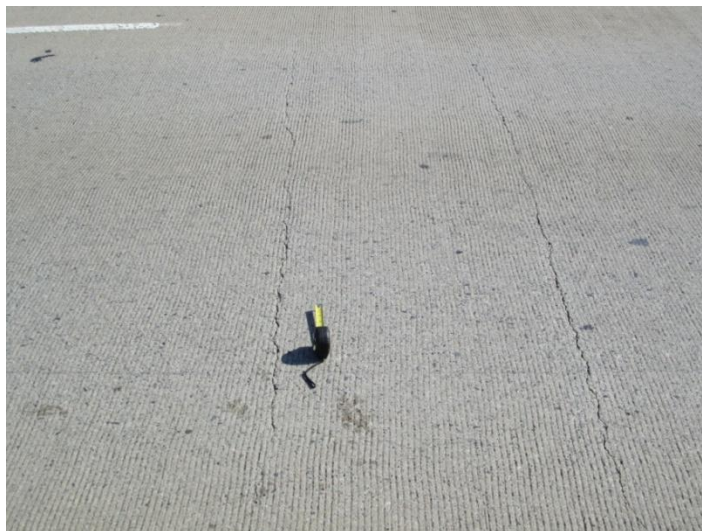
Typical transverse cracking on bridge deck 7N.
